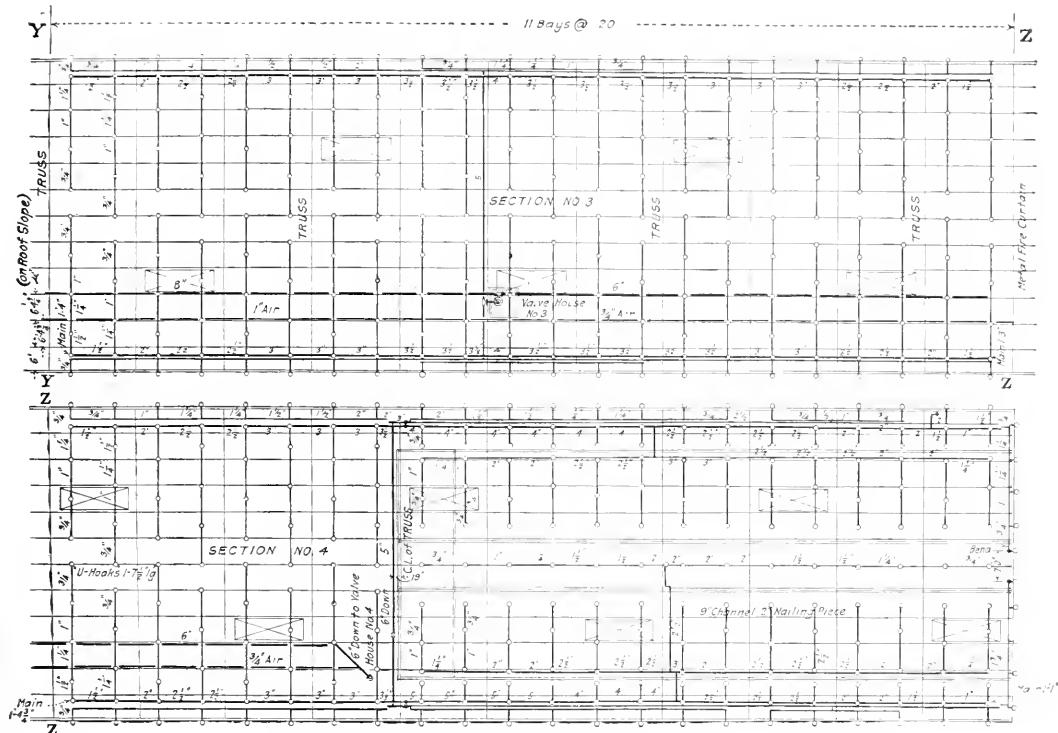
SPRINKLER LAYOUT FOR A TYPICAL PIER PROPERTY—CONTINUATION OF FIG. 3
